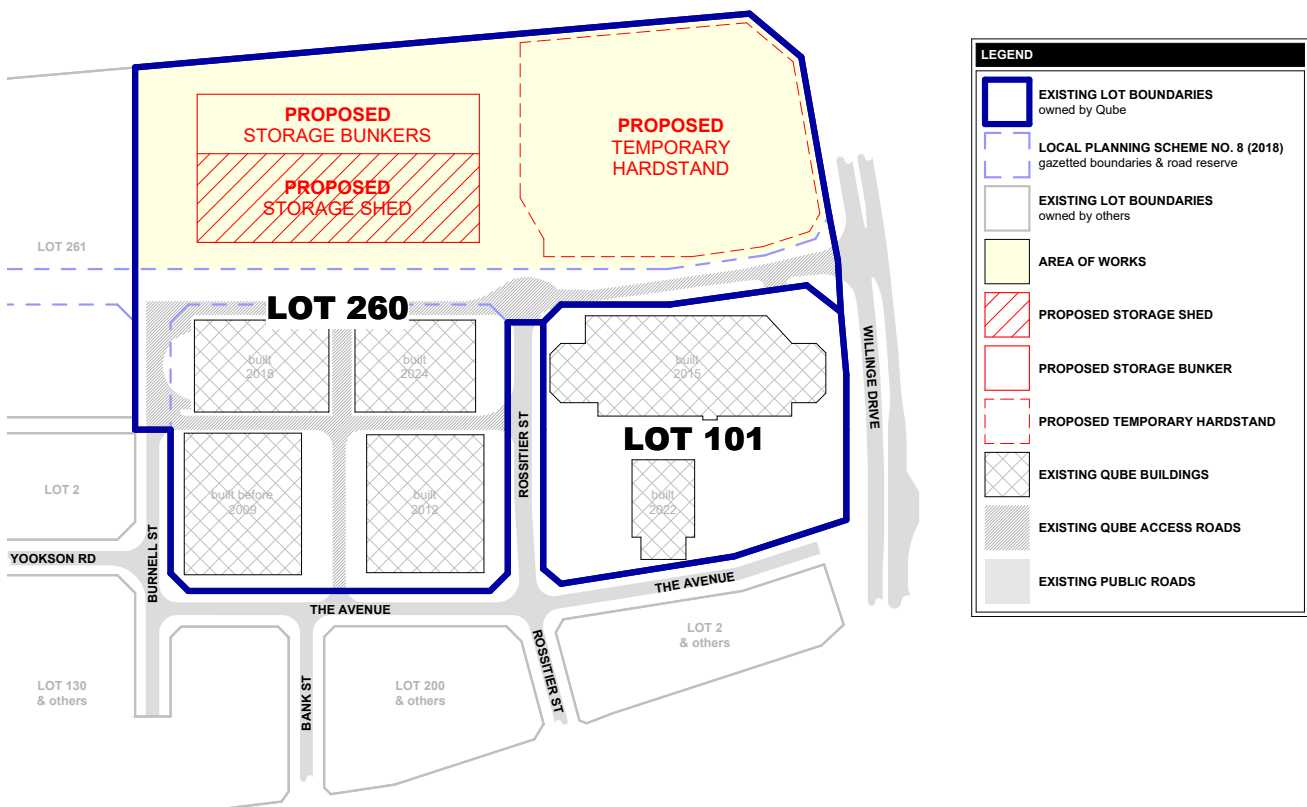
Existing Development and Approvals Plan - Lot 260 and 101
